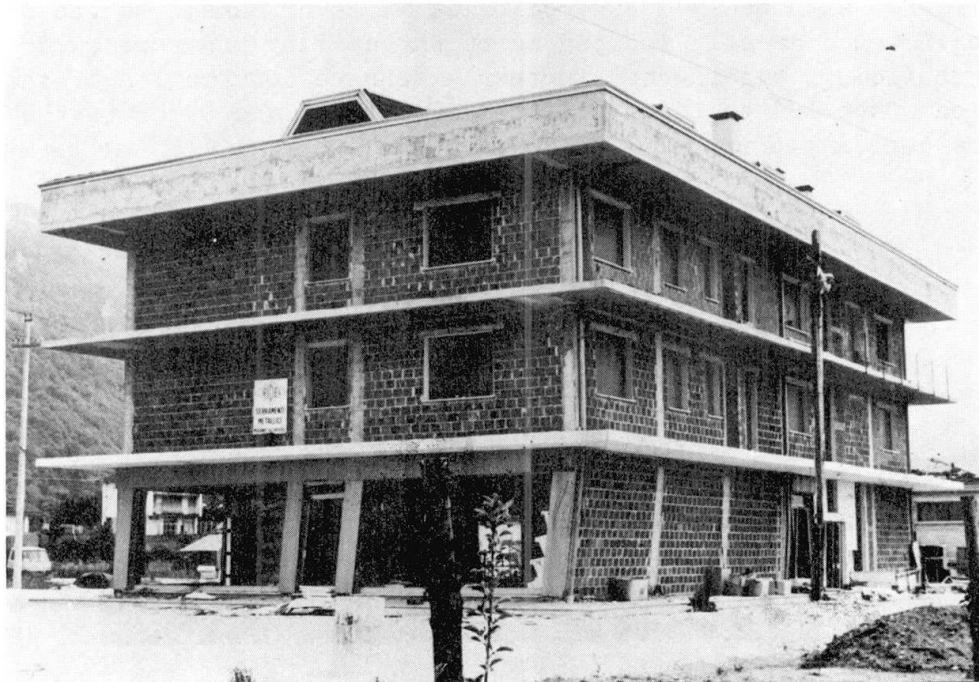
(after May 6th): Residential building with shop near Artegna. Reinforced concrete frame building with brick partitioning in the two upper storeys. In the groundfloor, open on three sides, only the rear longitudinal wall and the staircase are braced. The destruction was concentrated on the groundfloor where a rotating motion of approximately 40 cm maximum displacement occurred around the staircase core. The brick walls of the staircase were badly destroyed, while those of the upper floors remained undamaged.
